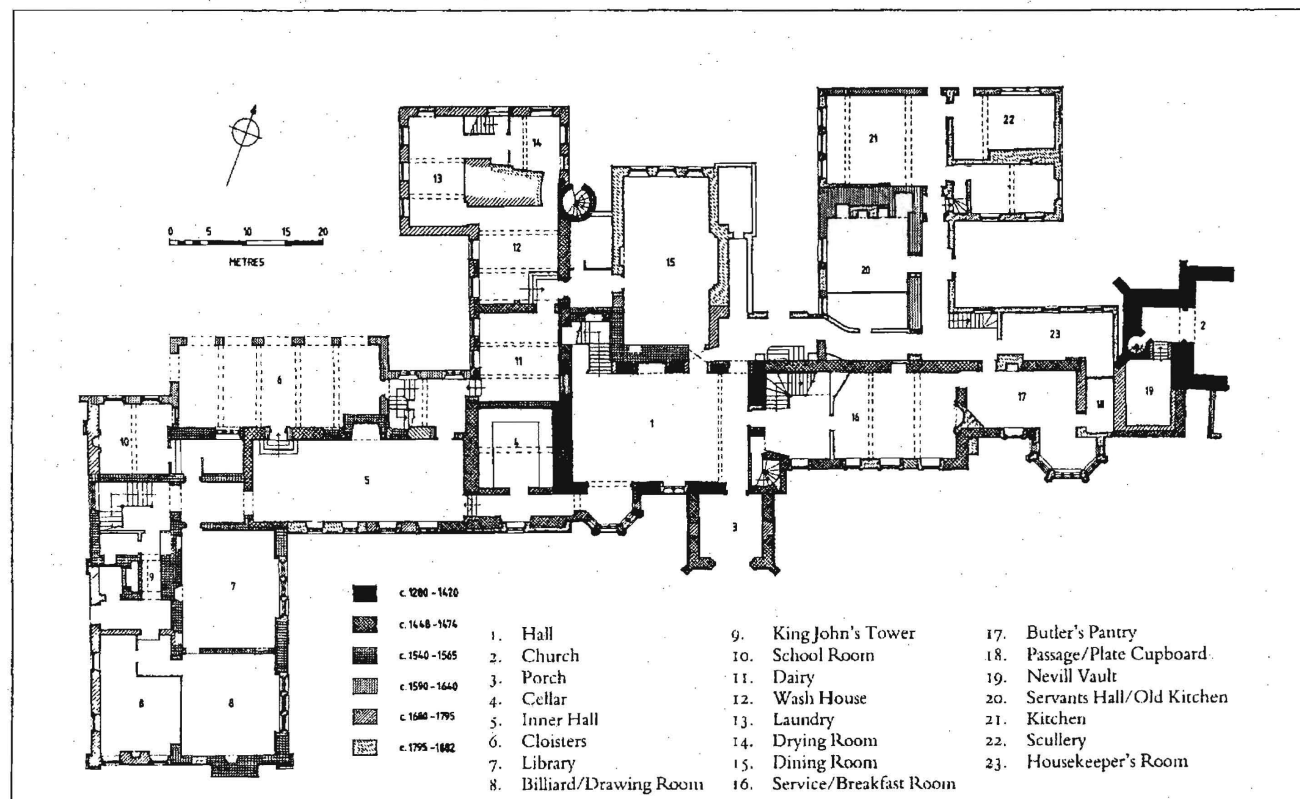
Ground floor plan (after N. Hill 1999, 247).
